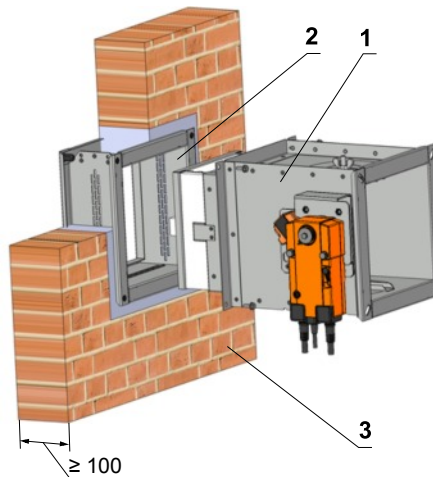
Solid wall construction - installation frame E1, E2, E4
